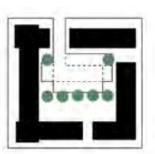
"Perimeter block' layouts use the buildings to protect the interior open space areas, making a clear distinction between public and private space
